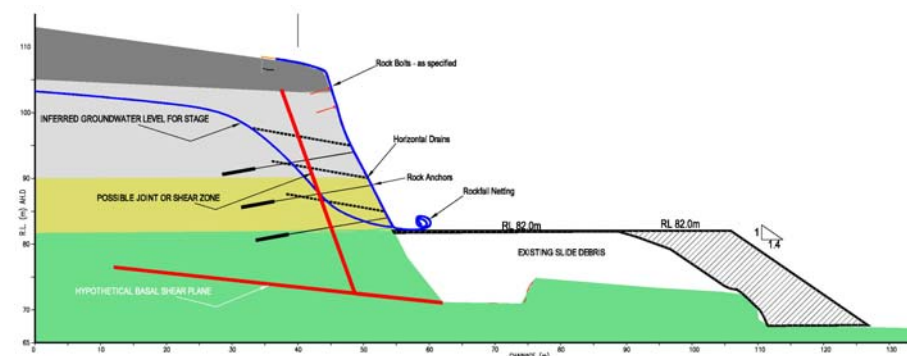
Stage 3 - Excavate landslide and install mesh, drains and 2 rows of rock anchors.
